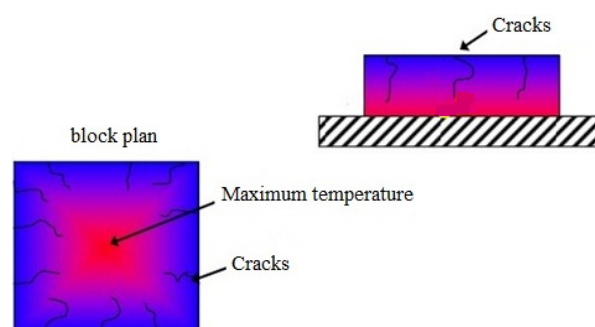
Mechanism of thermal crack formation in the mass concrete structure, /4/.
